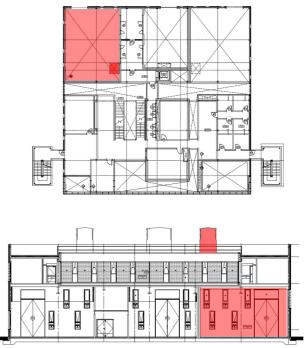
Plan and rear elevation of the Jarman building. The dance studio is highlighted in red.
